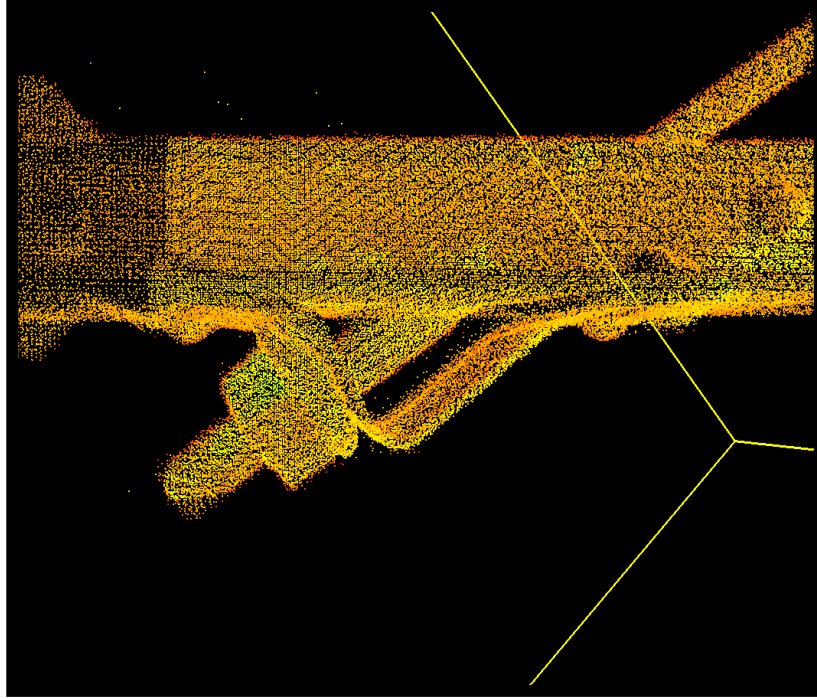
Scan of a sway bracing connection from the Ward's Crossing Bridge.
